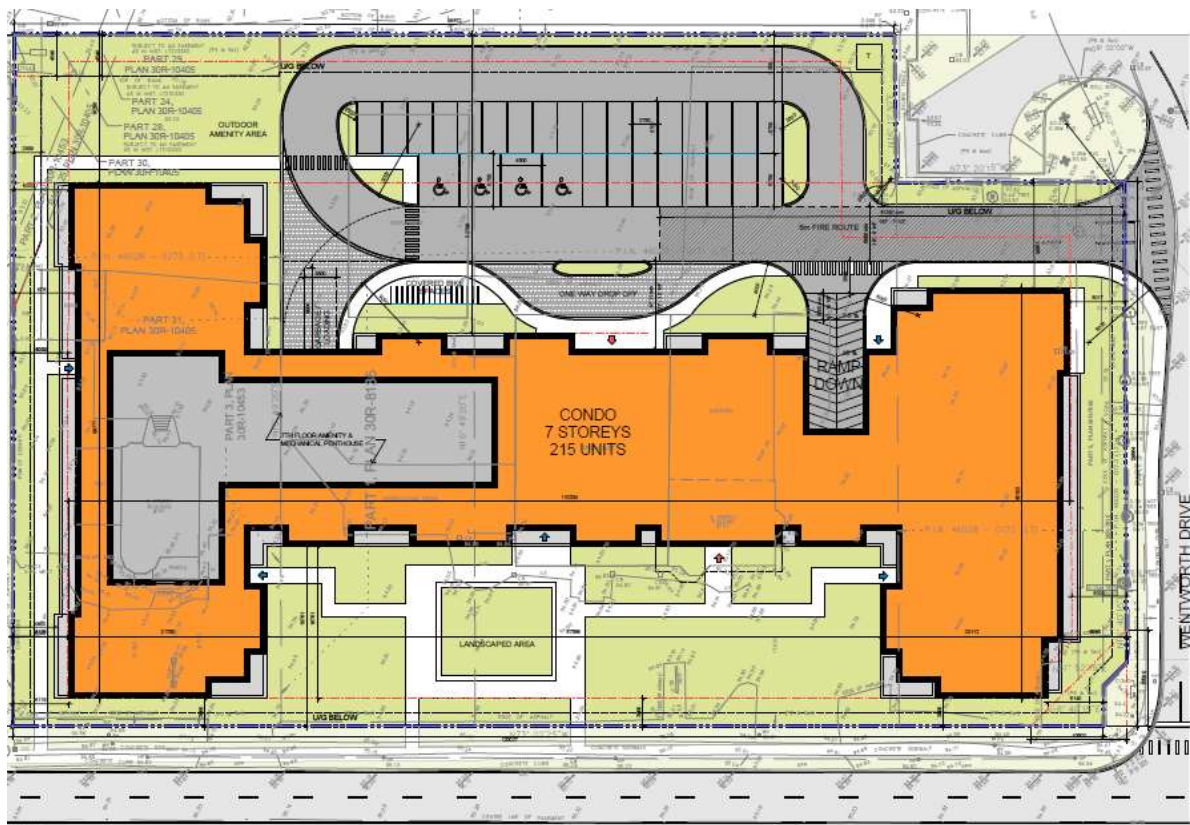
Proposed Site Plan (Source: Chamberlain Architect Services Limited, 2020)
